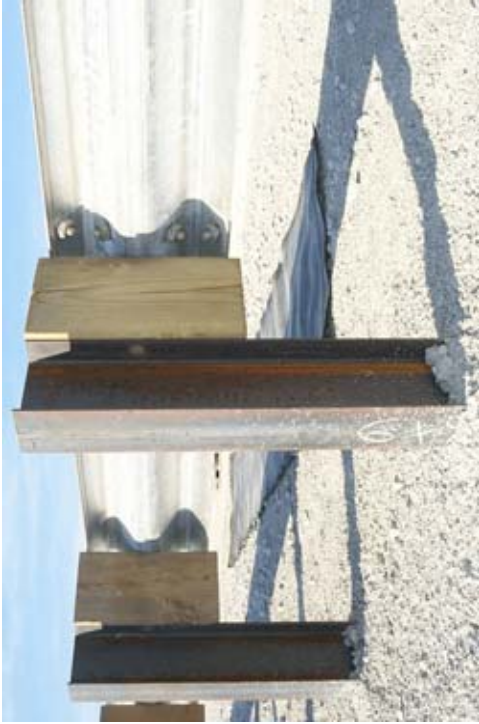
Typical Post for W-Beam Guardrail Attached to a Low-Fill Culvert (Option No. 1)
